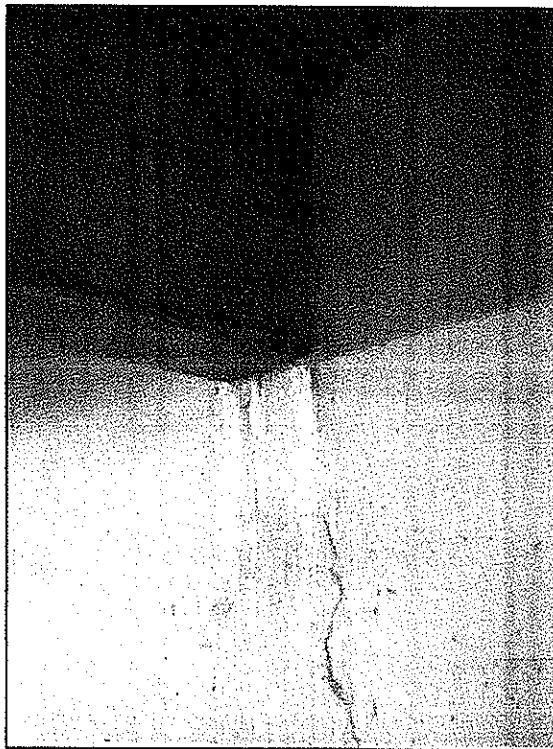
Water intrusion at beam-wall connection (wall cracking)
